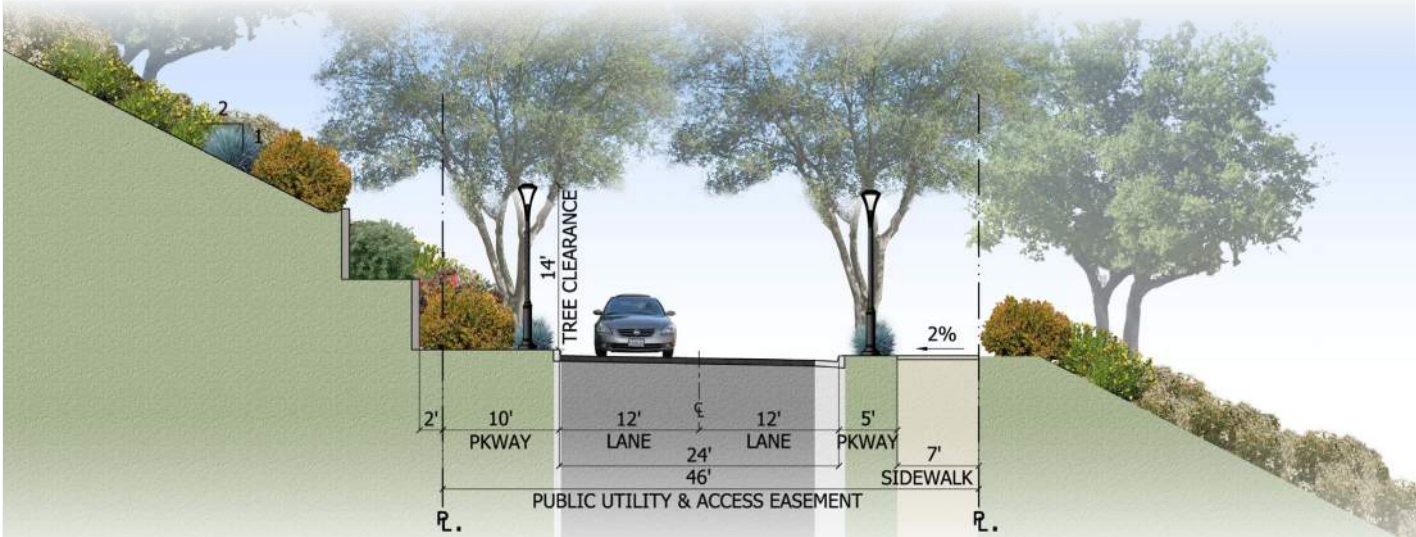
Street Section - B Street North (Private, portion of TTM lot L)
